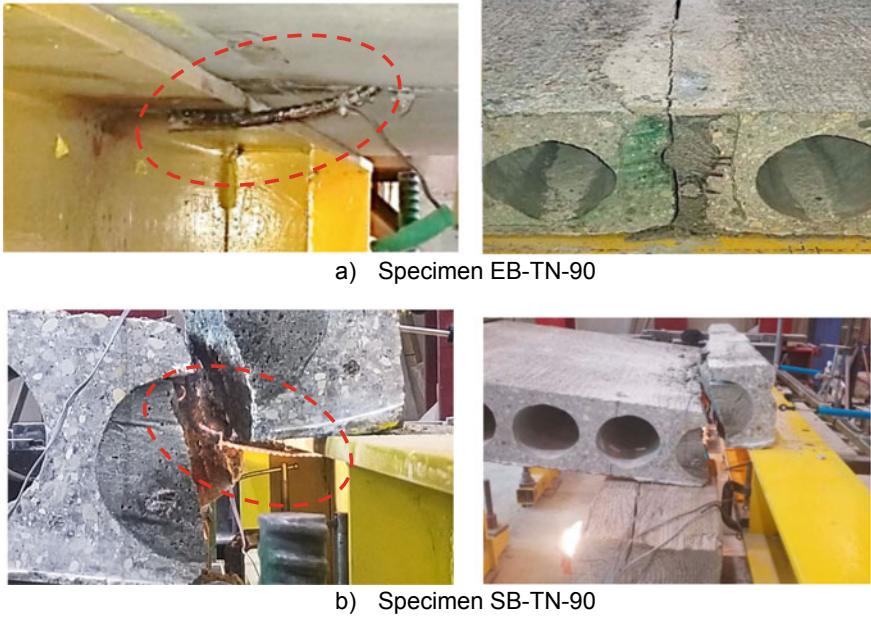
Failure modes of specimens tested under tension. Bar flattening (yielding) followed by grout splitting
